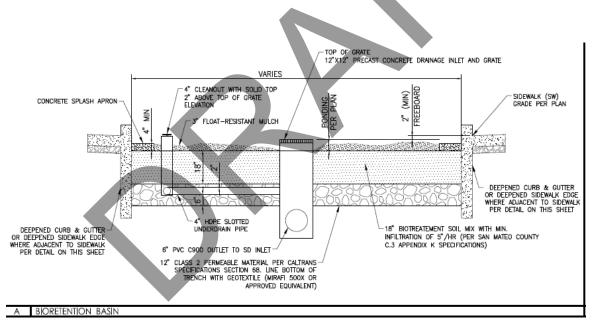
Typical design detail of the Mariposa Street and Santa Clara Street bioretention facilities, Brisbane, CA.
